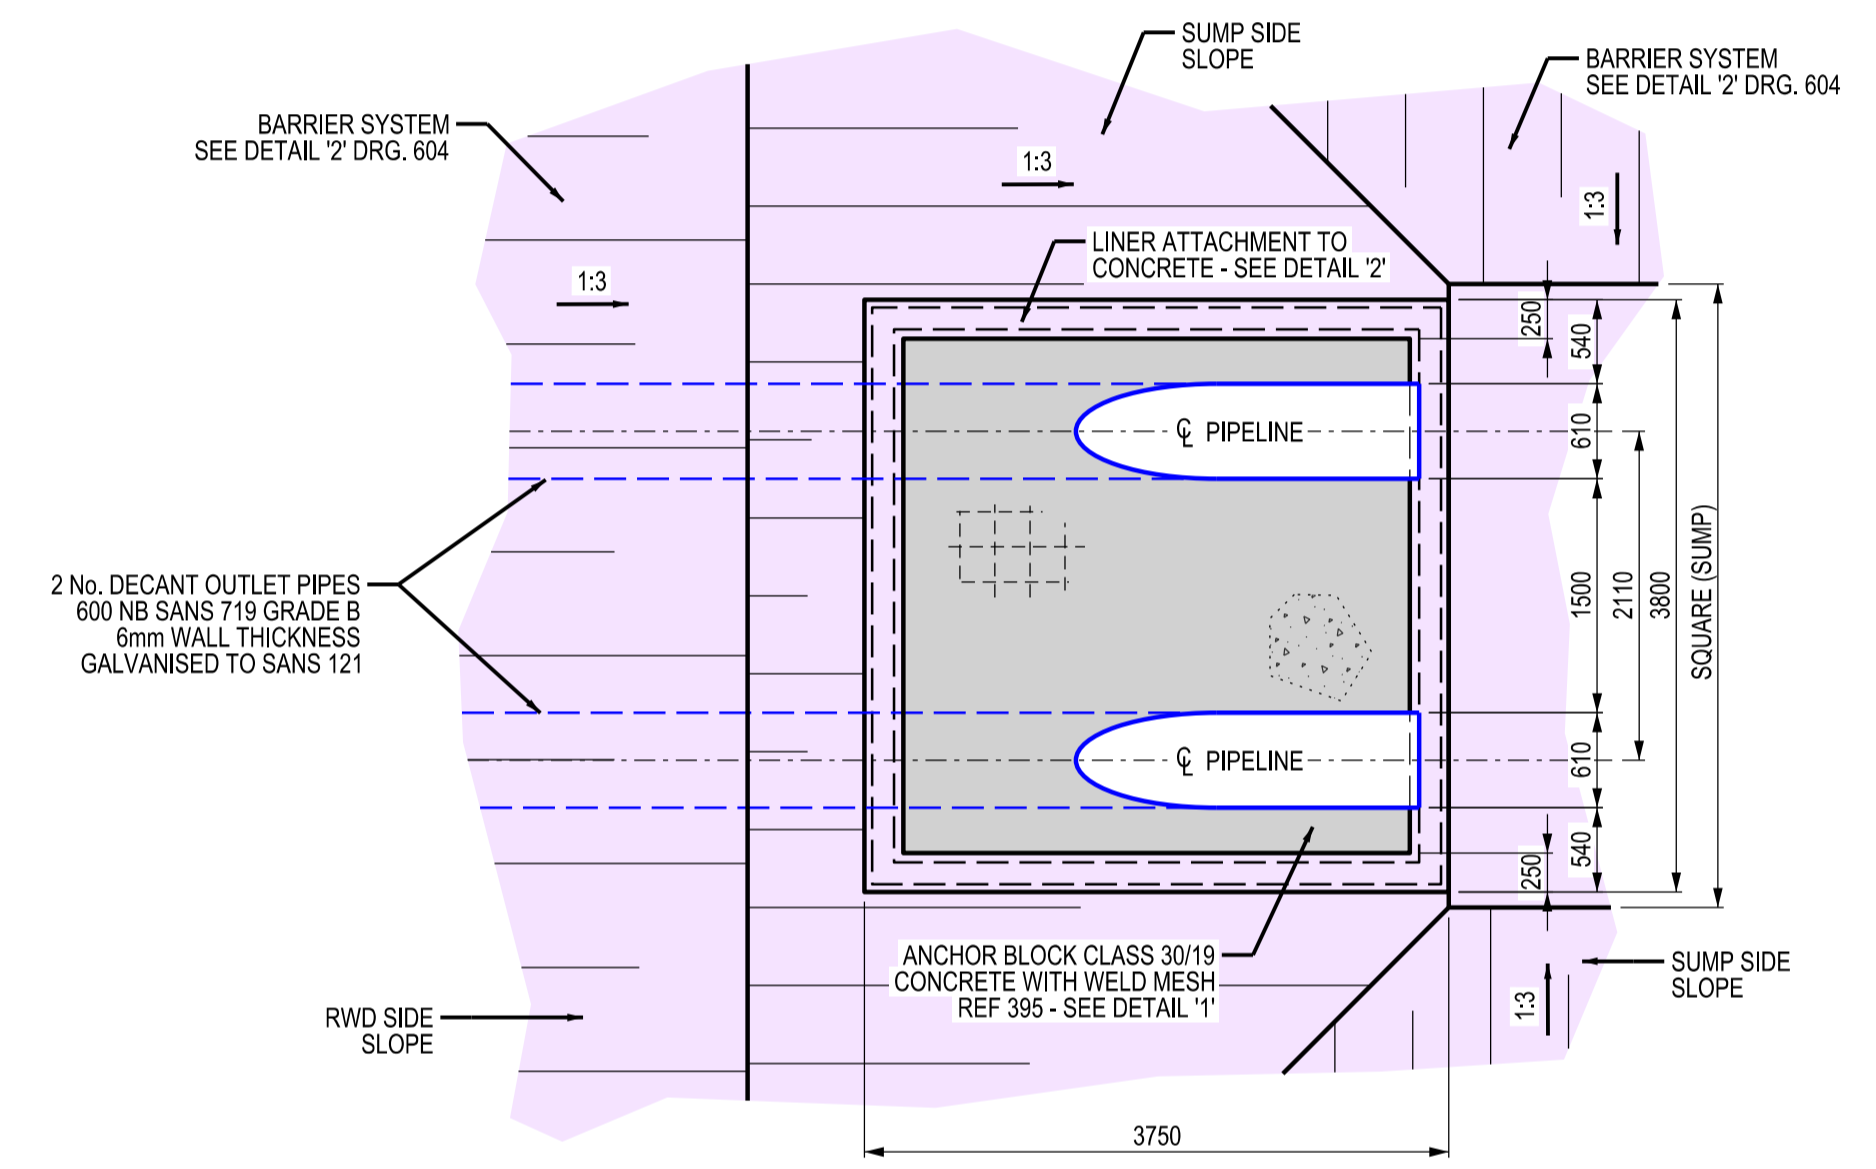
' - SECTION - DECANT OUTLET PIPE ANCHOR BLOCK
